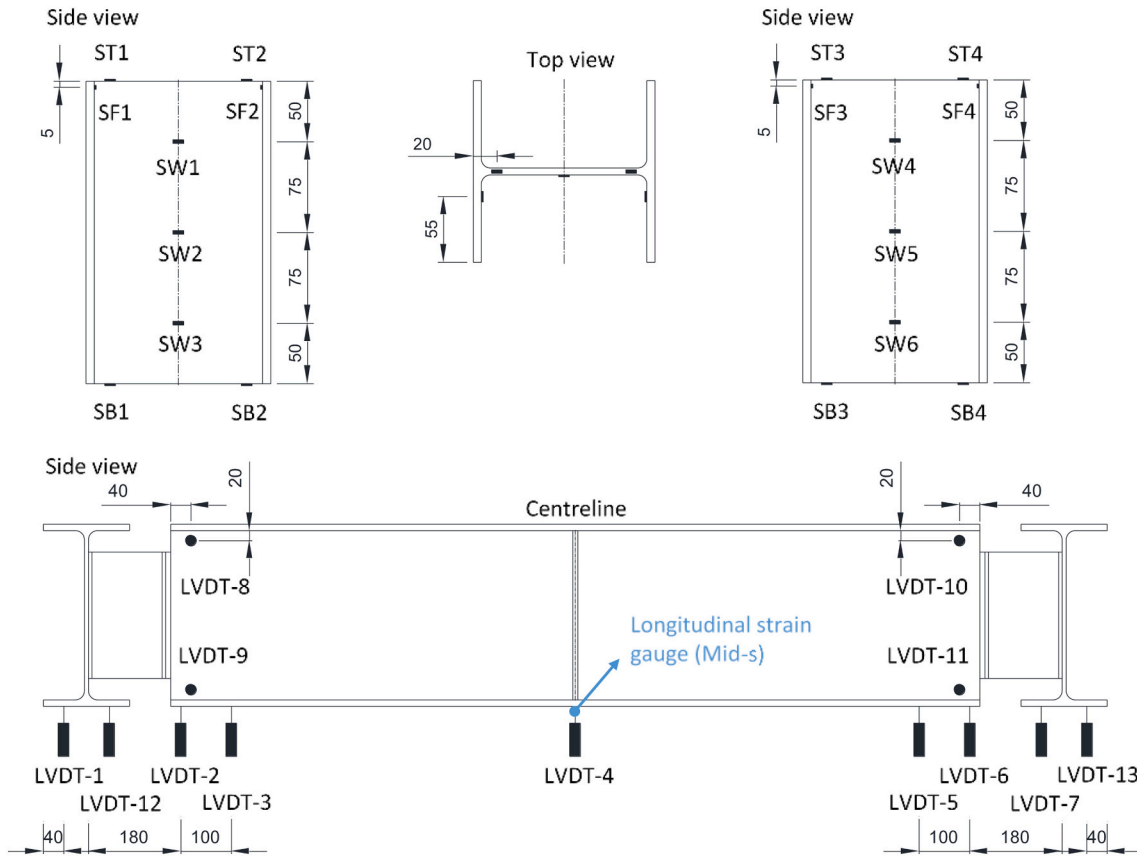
Arrangement of strain gauges and LVDTs (dimension unit: mm).
